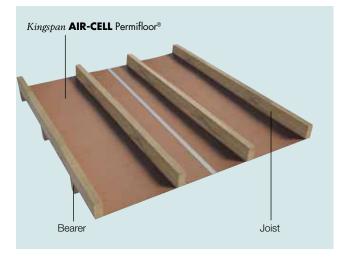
Kingspan AIR-CELL Permifloor® installed over bearers
